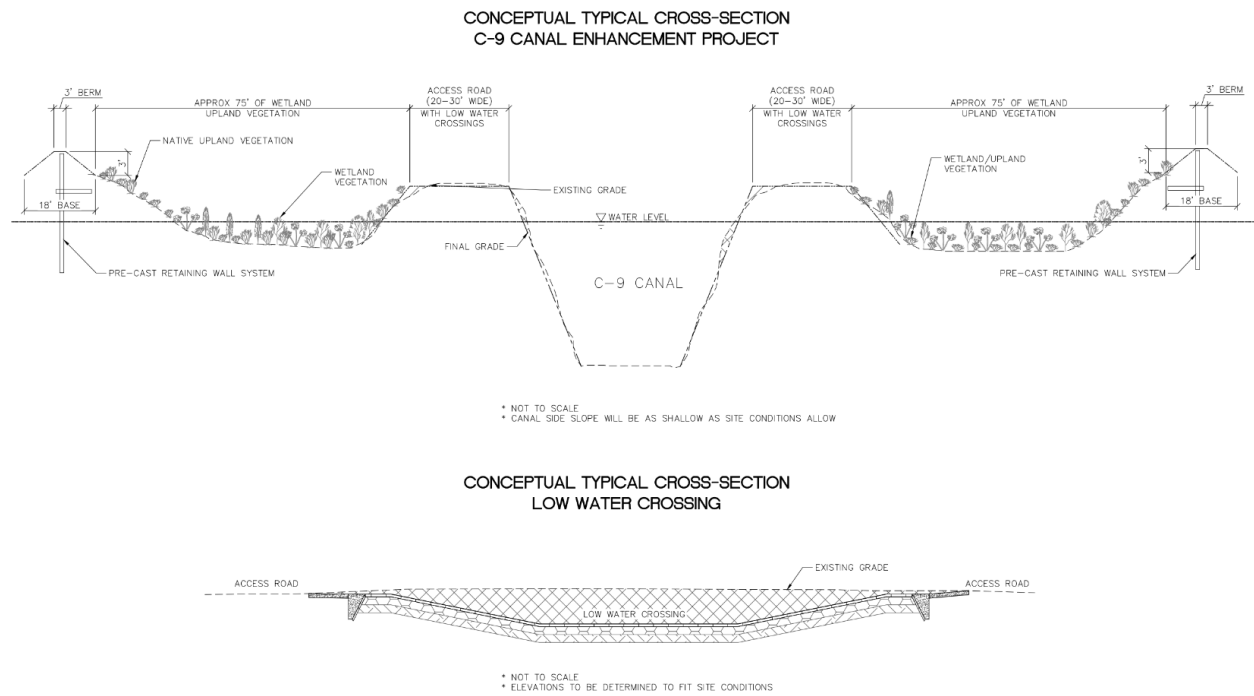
Typical cross-section of the C-9 Canal Enhancement project showing potential project features.
